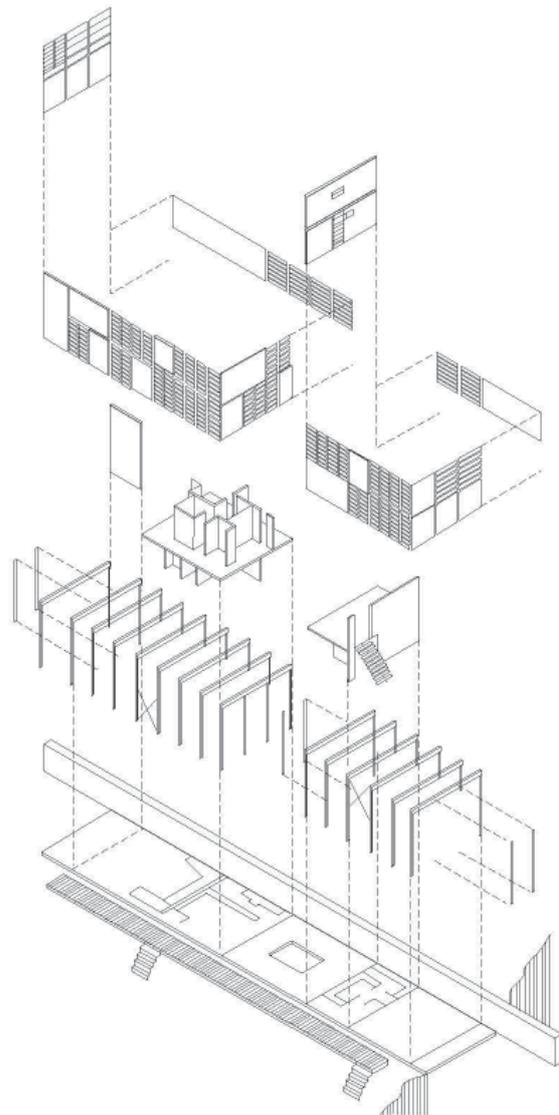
Eames House. CSH #8. Construction Components. Exploded axonometric
